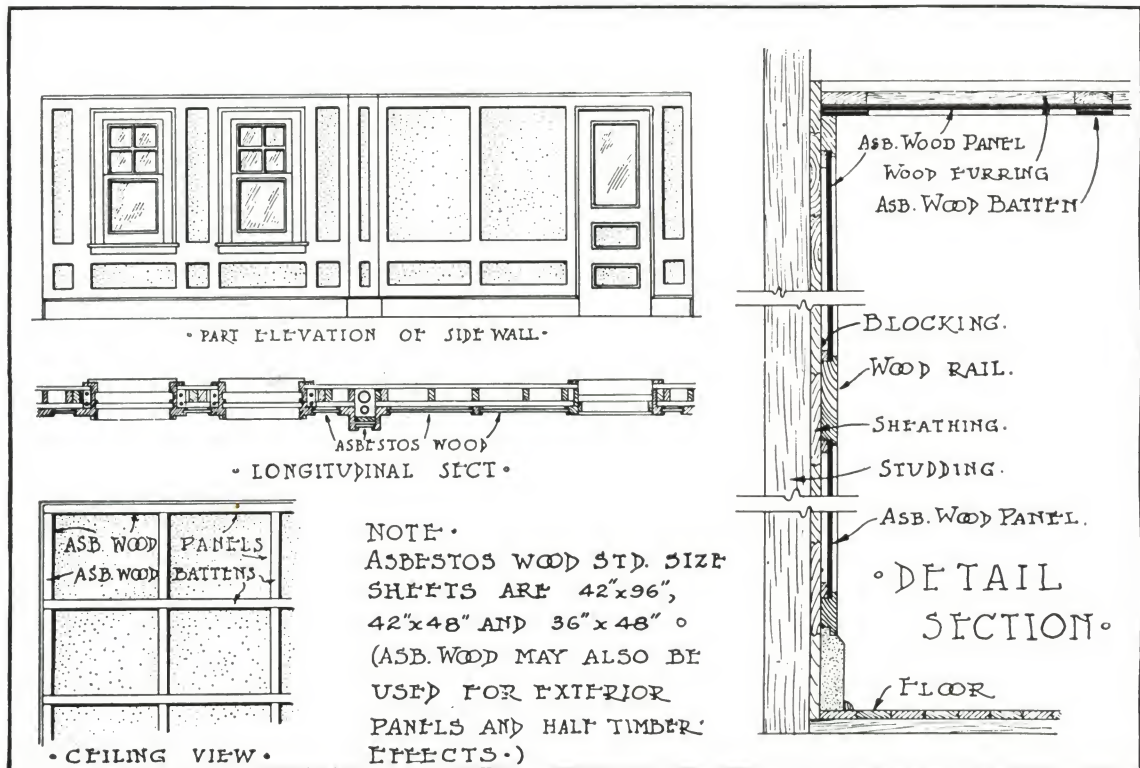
Application of Standard Transite Asbestos Wood as wall panels with batten strips.
